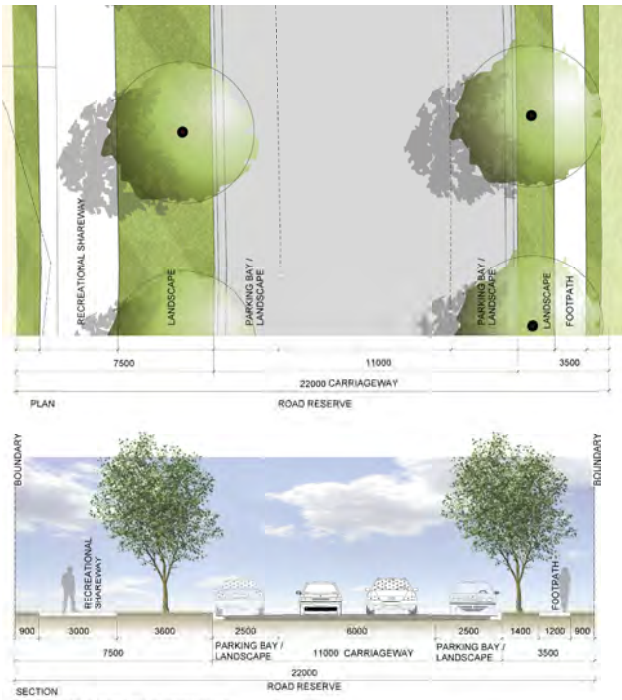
Typical Detail: Open Space Road (Major With Cycleway)
